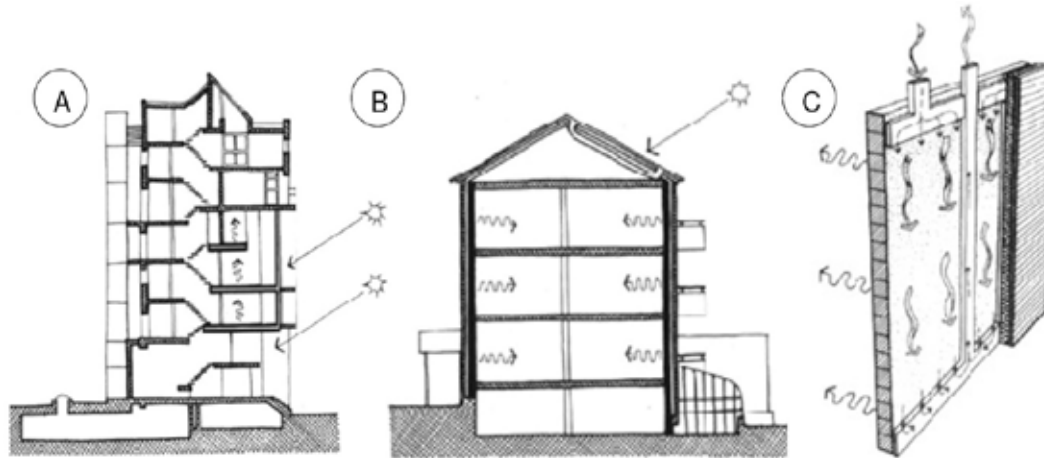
A Hypocaust in the Lutzstrasse Berlin: 6 B and 6 C Murocaust apartment Block in Gothenburg (Hastings and Mørk 1999)
